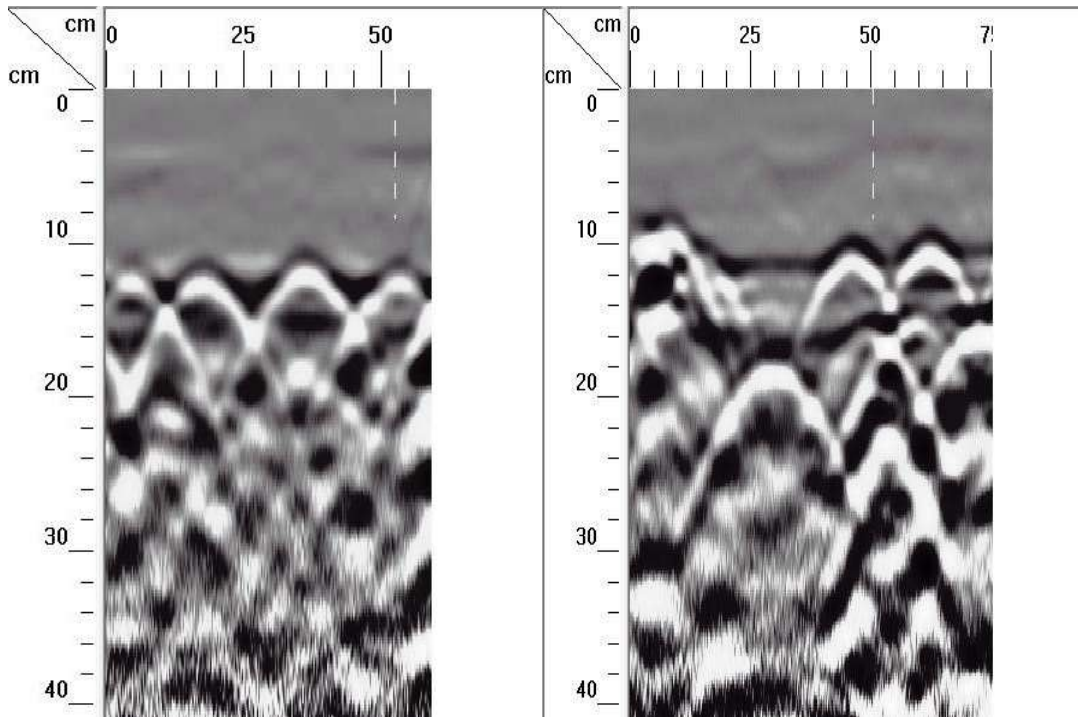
Rebar & Proposed column location -9 Layout
